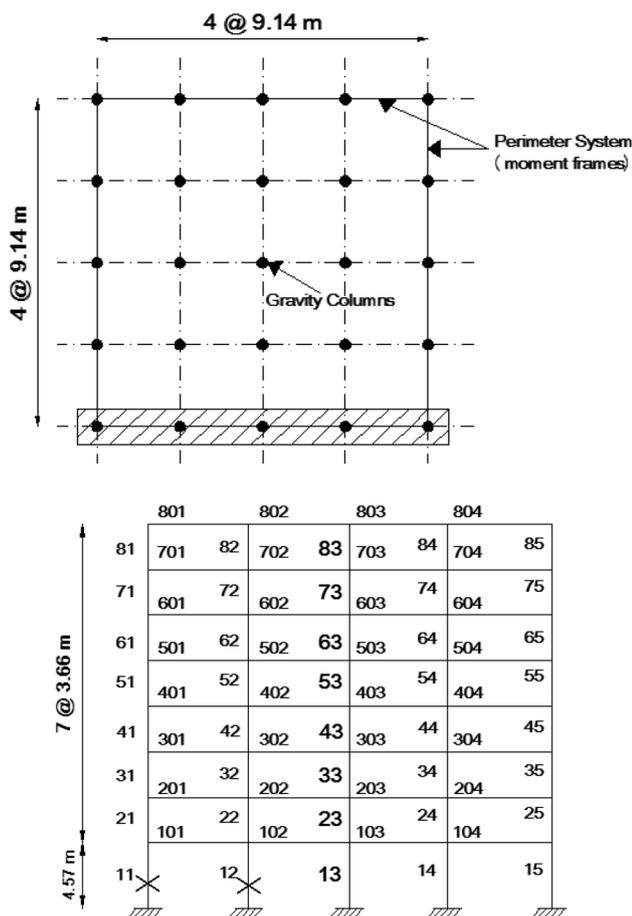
Plan and elevation view of the structural model with scenarios of the column removal
